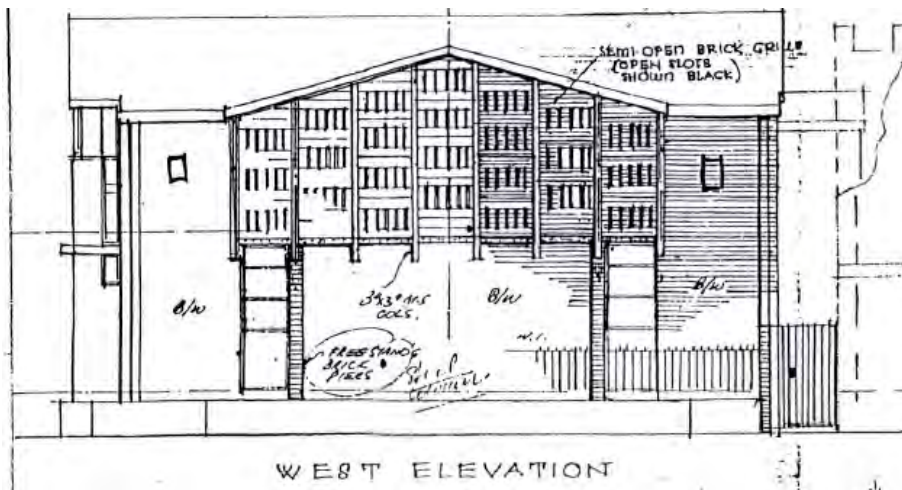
Drawing dated November 1964, (Dr. Ernest Fooks), showing west elevation. Stamped 13 December 1964 in relation to permit no. 602). (Source: Council Building File)
